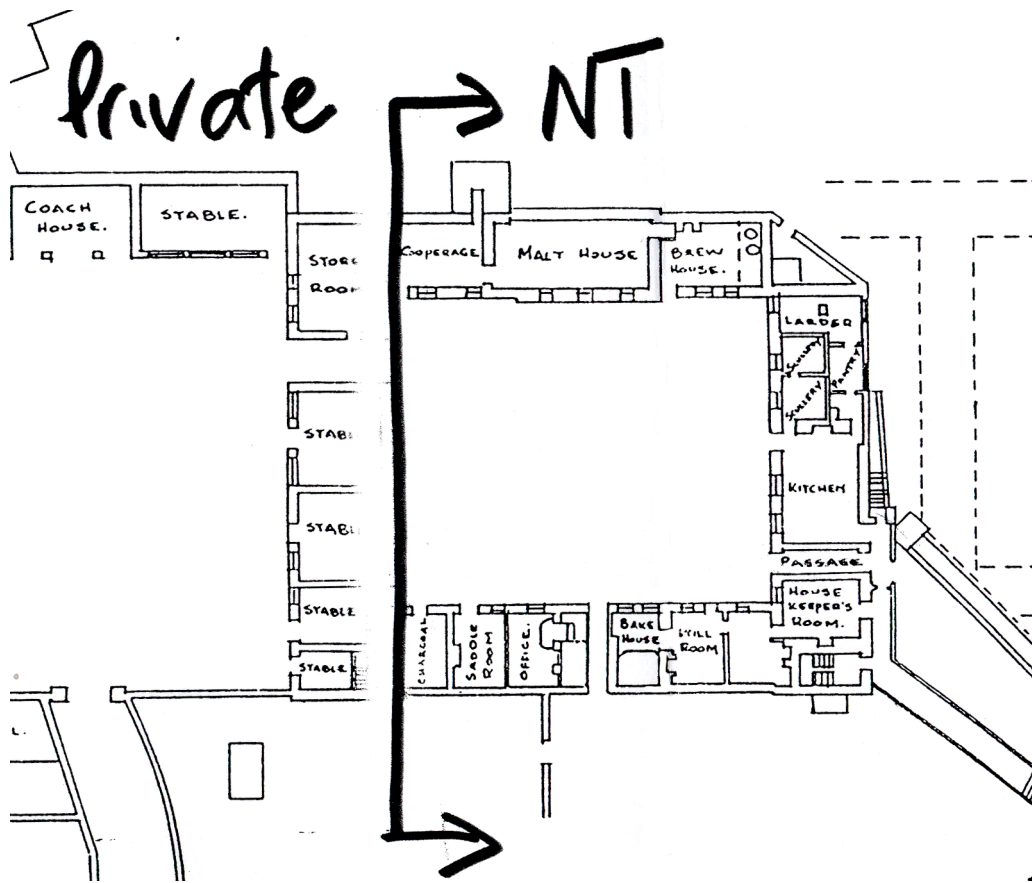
Extract from a pre 1896 plan of 'Dynevor Castle'
